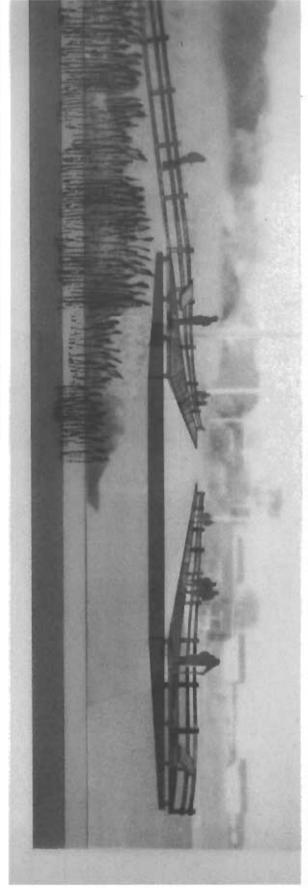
Looking north to Commercial Siver from the pier across the proposed Virely Bridge.
